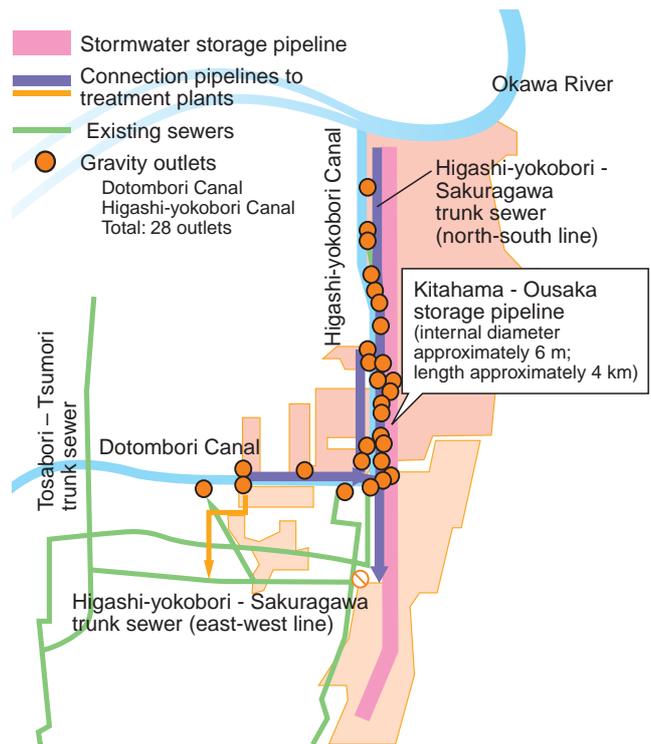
Plan of Kitahama - Ousaka storage pipeline
